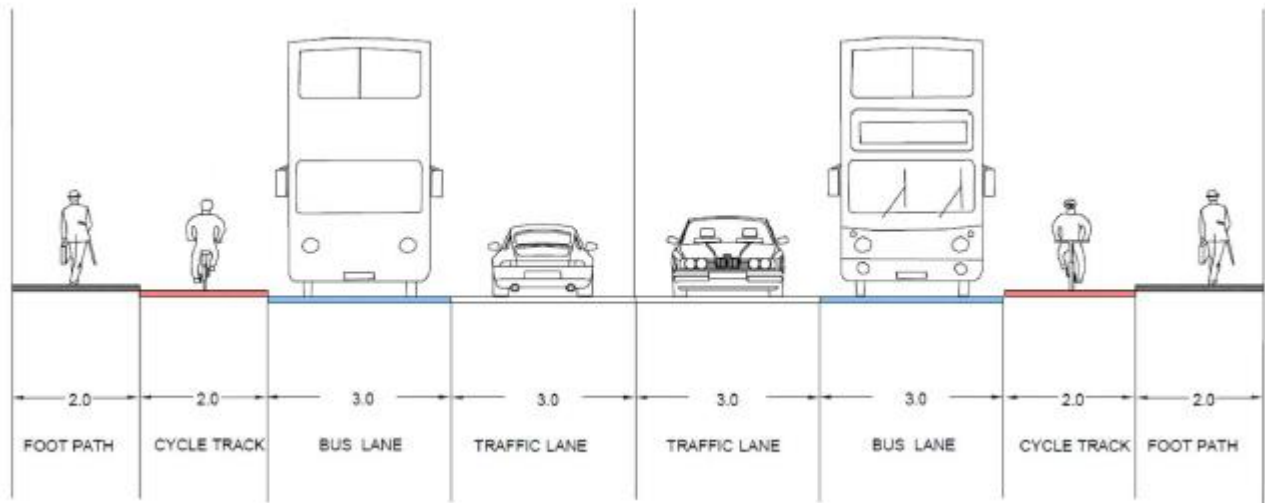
Proposed EPR Subsection 3.2B Indicative Cross-Section
